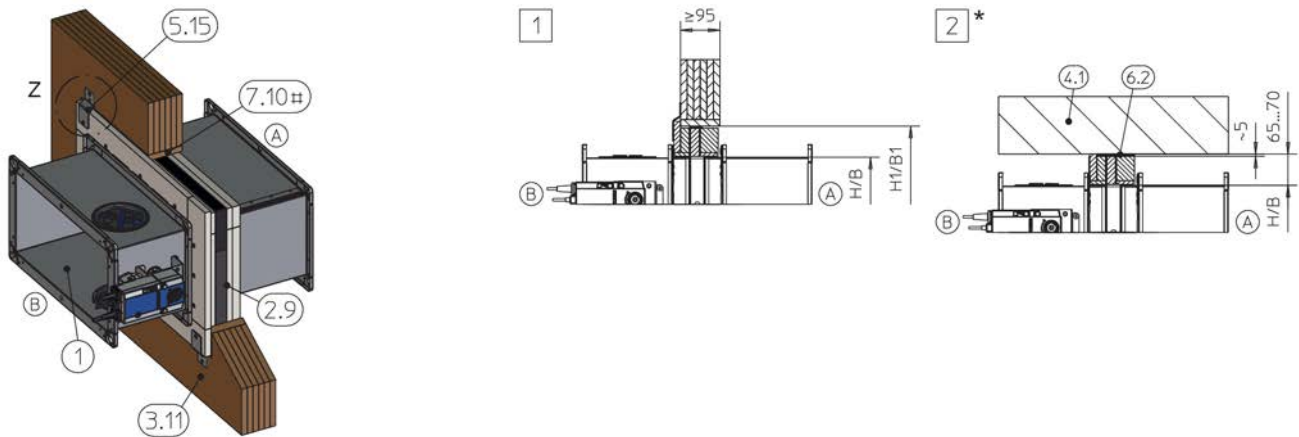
Mortar-based installation into a solid wood wall or CLT wall
